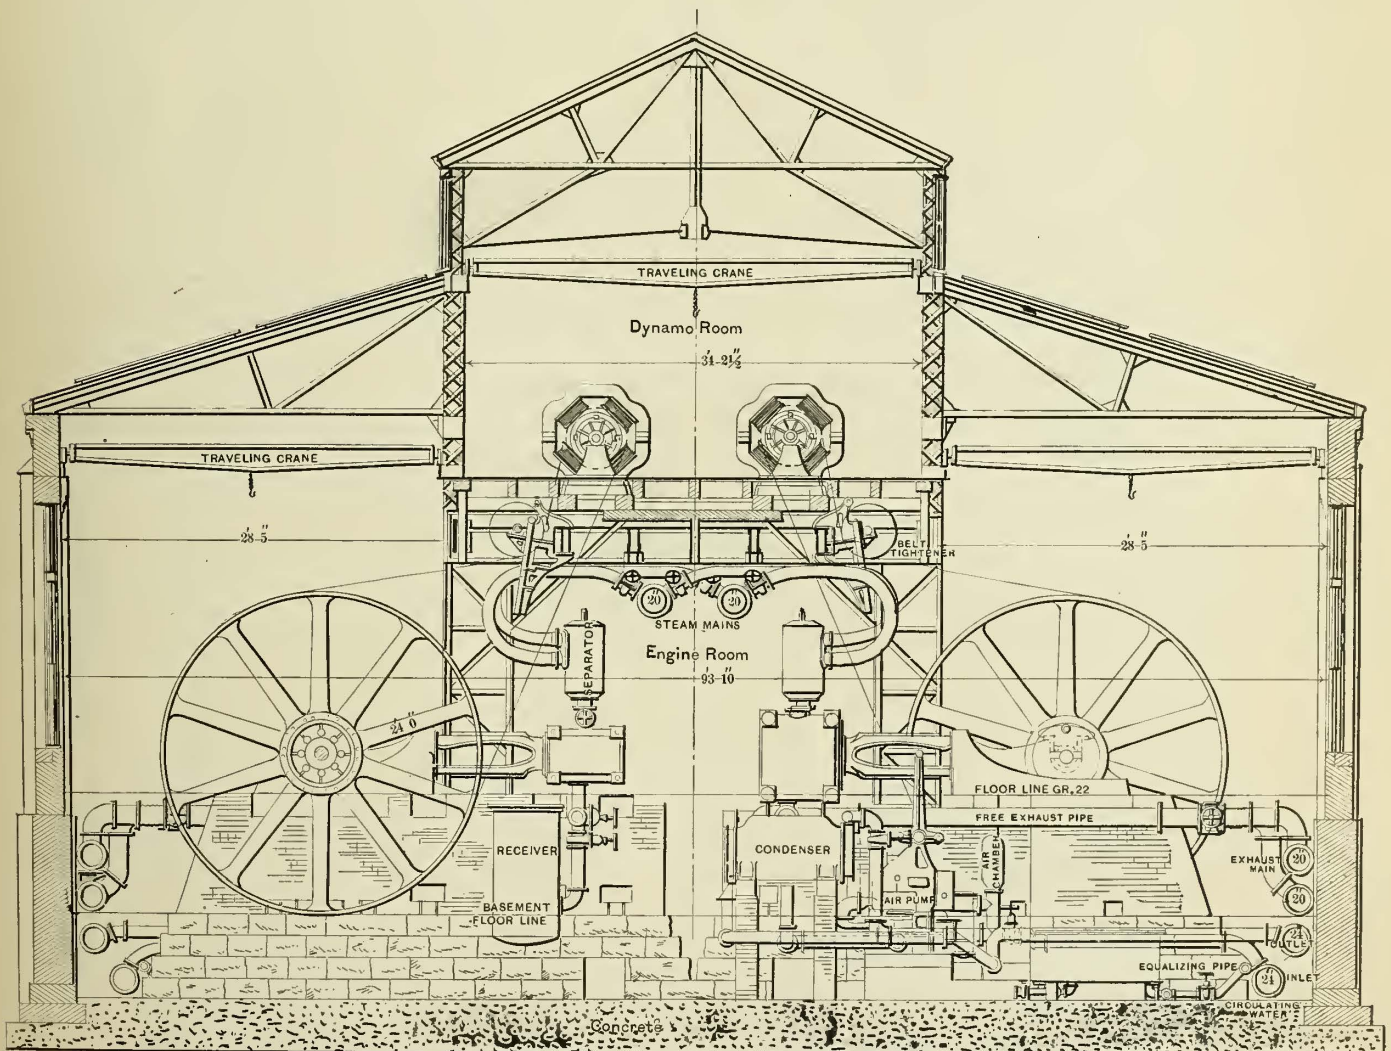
SECTIONAL VIEW OF ENGINE ROOM—SOUTHERN POWER STATION, BROOKLYN CITY RAILWAY CO.
